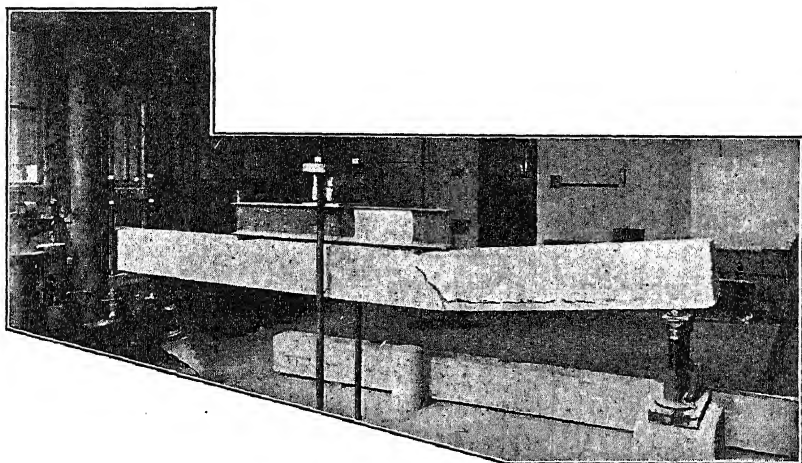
Failure of a reinforced-concrete beam.
